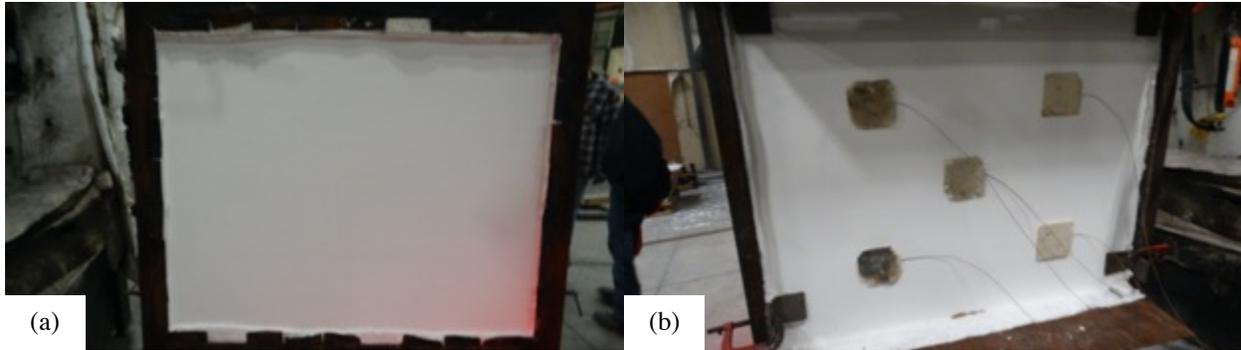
Assembly showing (a) blow-in insulation and (b) assembly in holder.
